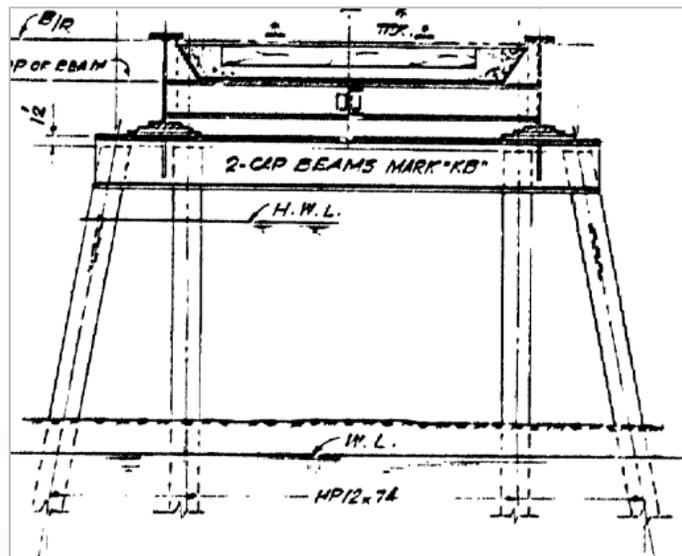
Cross section view of the PK 118.8 Chapais bridge
